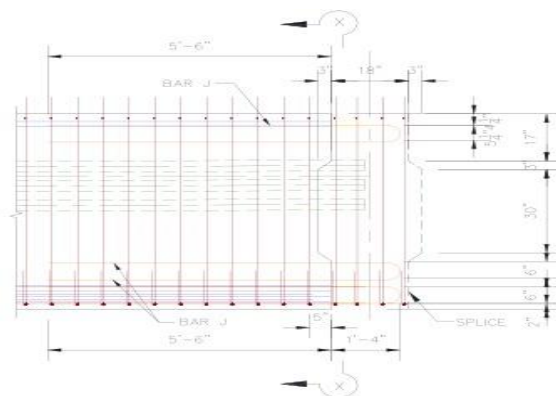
Detailing of the Splice (Hueste et al. 2014).
